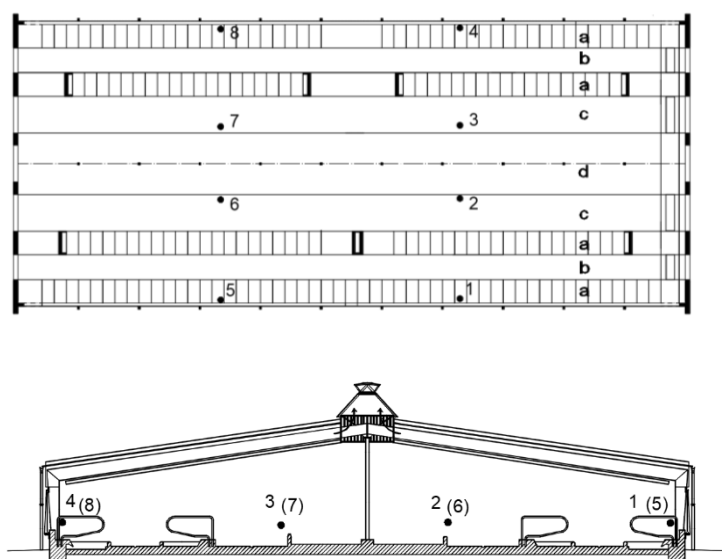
Ground plan and cross-section of the stable (A and B) with air sampling locations
